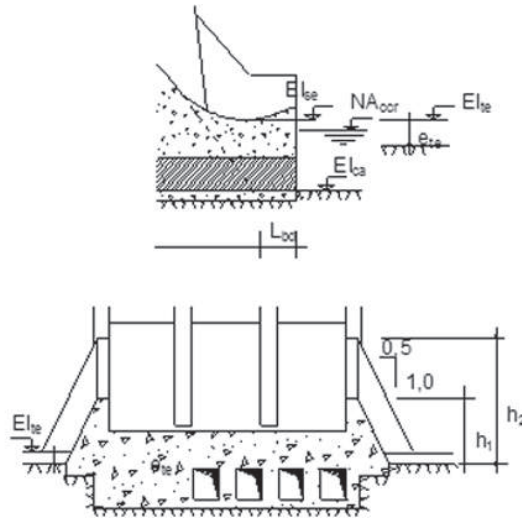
Typical cross-section of a ski jump.
